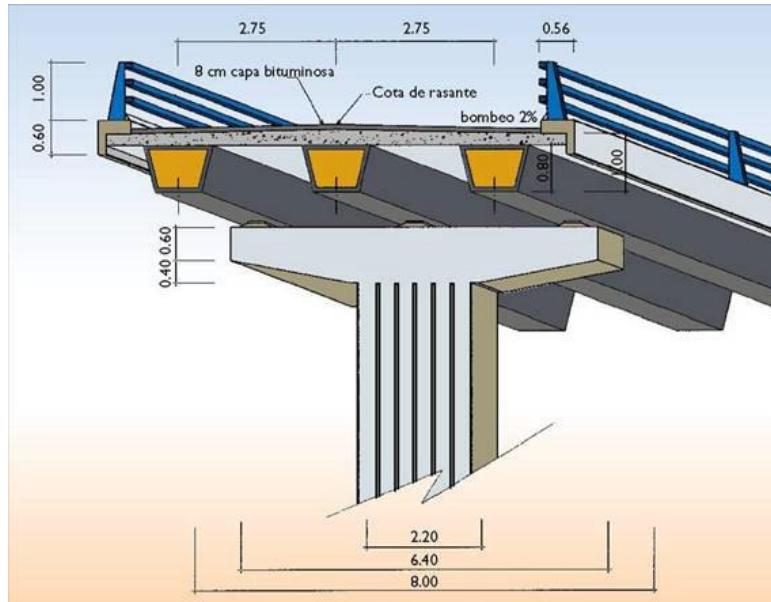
General cross-section of the Highway Bridge (Muniz & Bansal 2009)
